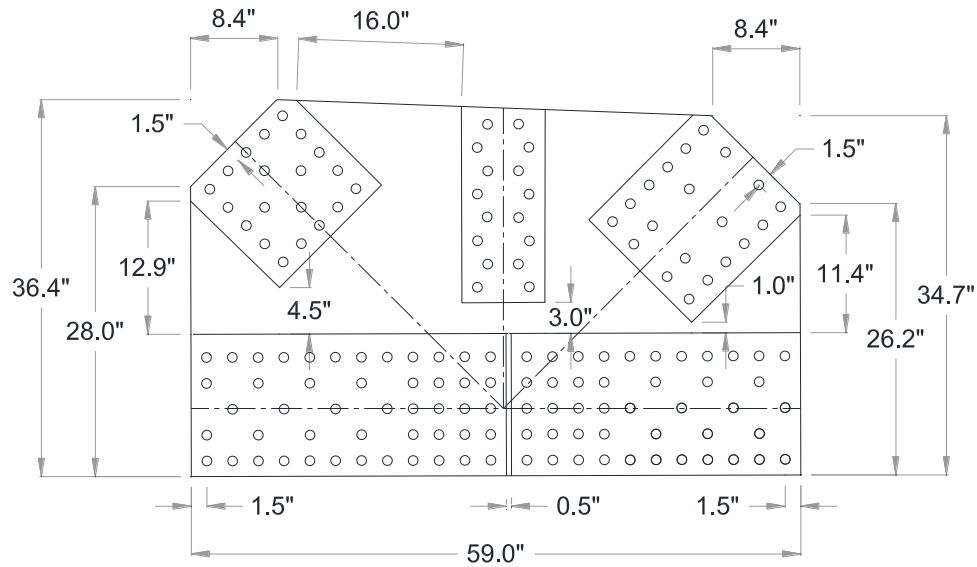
GP490-SS3 specimen gusset plate dimensions
